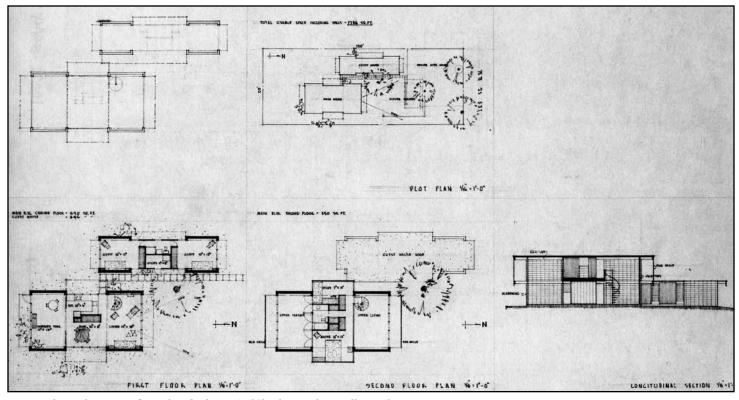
The Wicker House floor plan (built 1959), [Charles Reed, Jr. collection]
